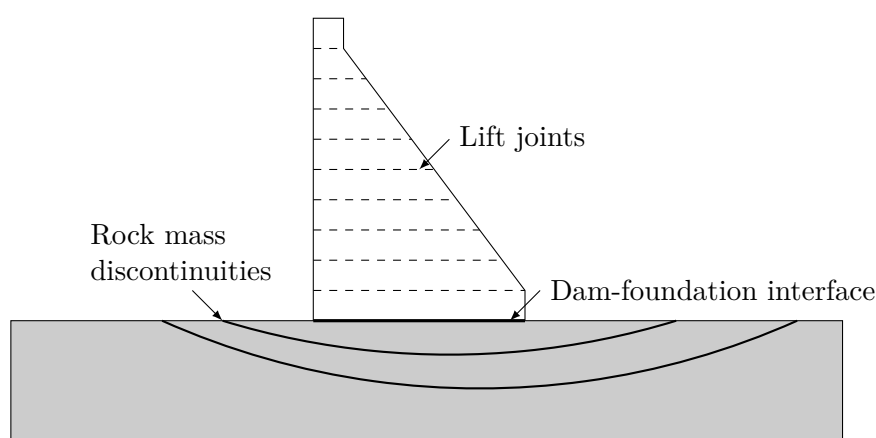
Potential failure surfaces of concrete gravity dams.
